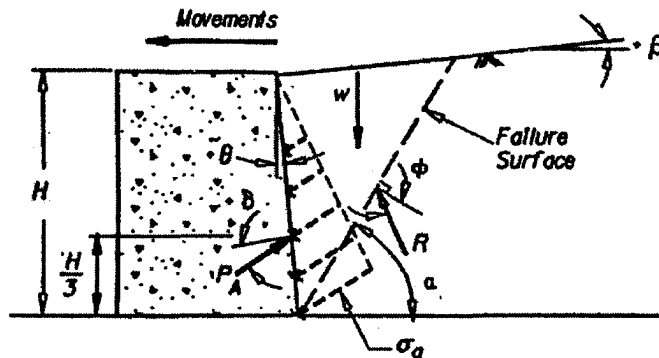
Coulomb active earth pressure for inclined backfills and walls.
